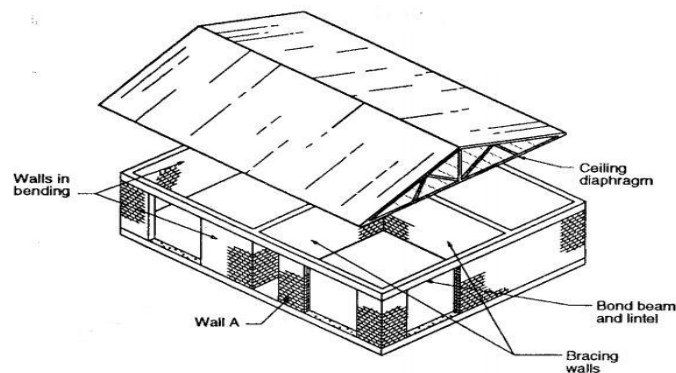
Lateral load resisting structural system of a single-storey masonry structure [3]
